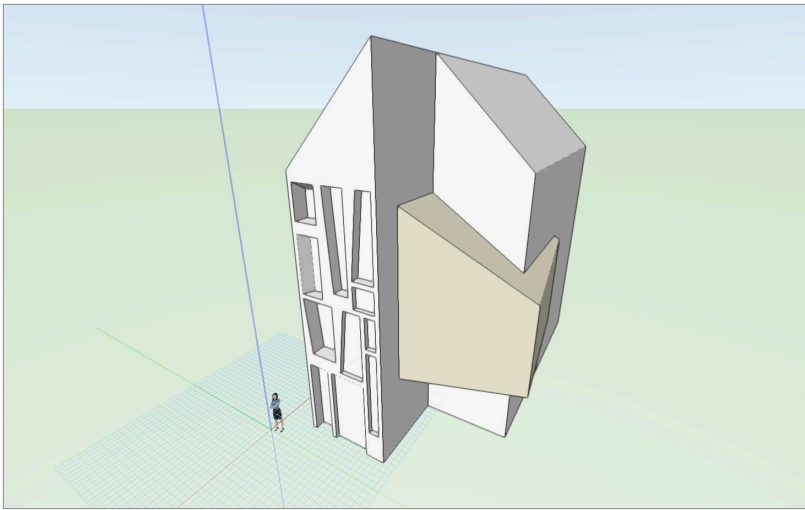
USING TAPER FACE TO MOVE FACES OF OPENINGS AT VARIOUS ANGLES
